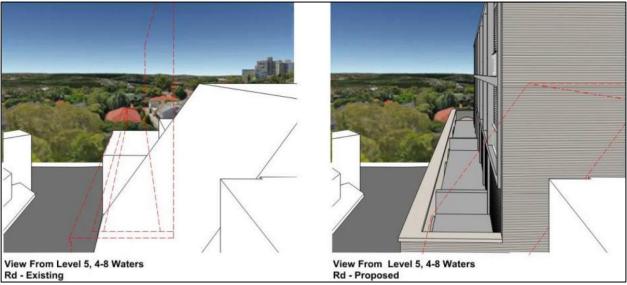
Existing and proposed view from level 5, 4-8 Waters Road (source: SJB Architects)
